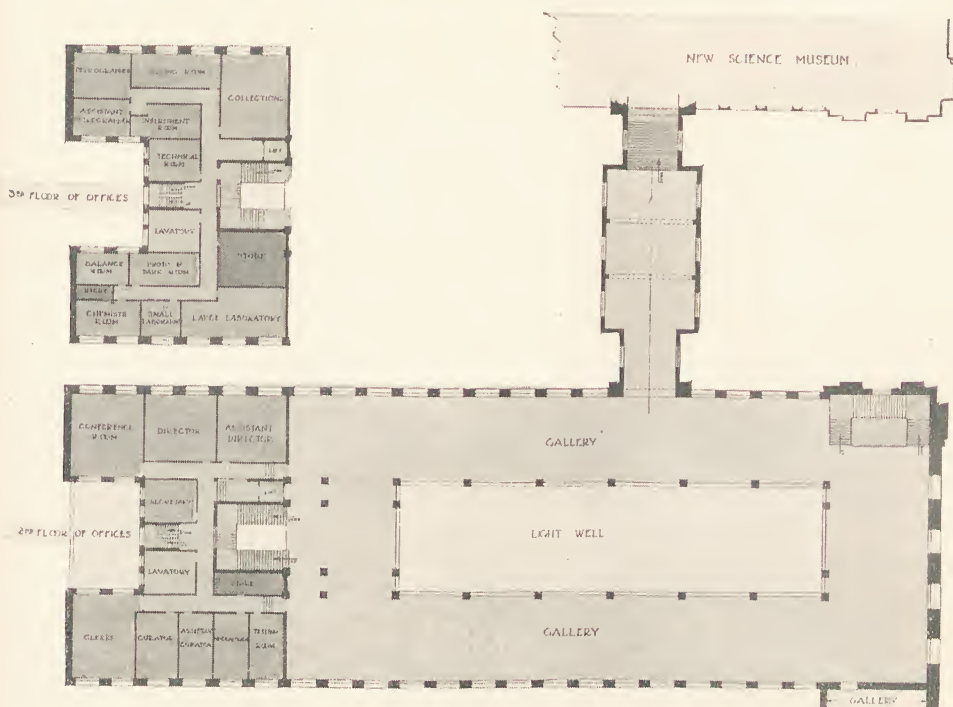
NEW GEOLOGICAL MUSEUM—FIRST-FLOOR PLAN
